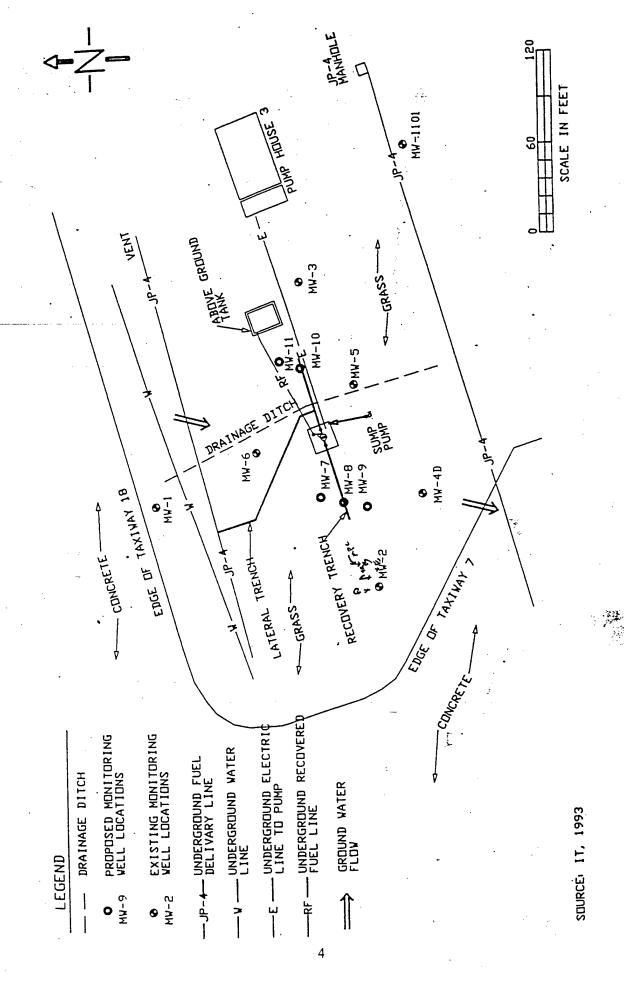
Locations of Existing and Proposed Monitoring Wells at Site SS-12.
